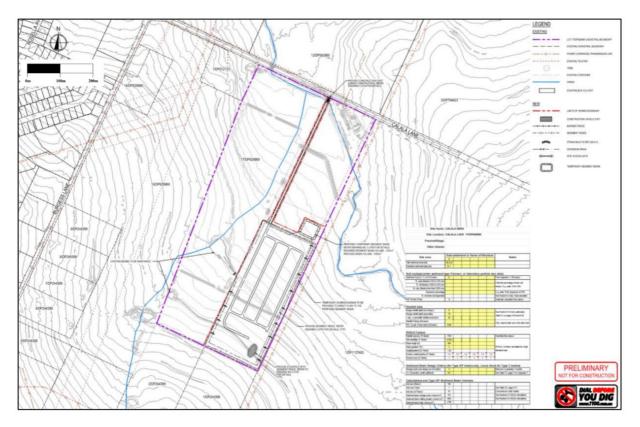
EXTRACT OF EROSION AND SEDIMENT CONTROL PLAN
